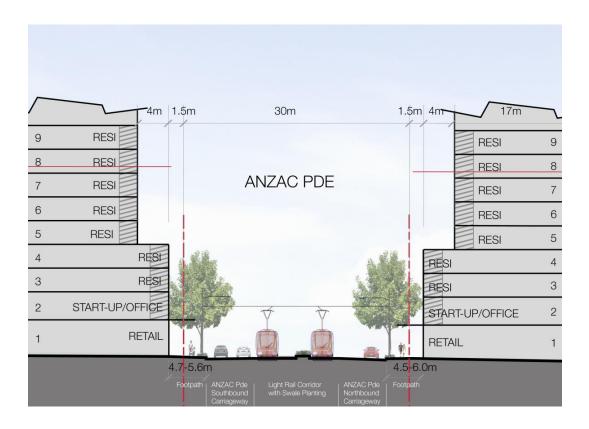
Section showing proposed 1.5m setback adjacent to 9 storey building Source: Conybeare Morrison 2016
